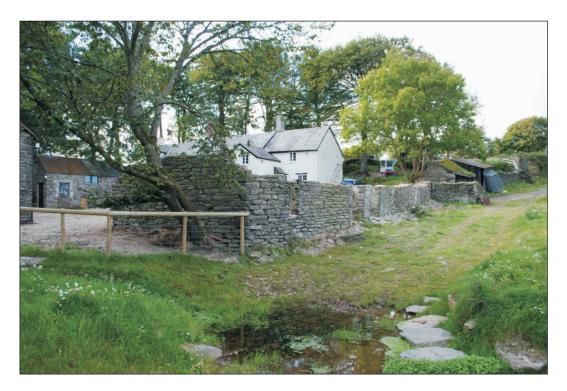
Completed works, east gable and north wall, viewed from the northeast
